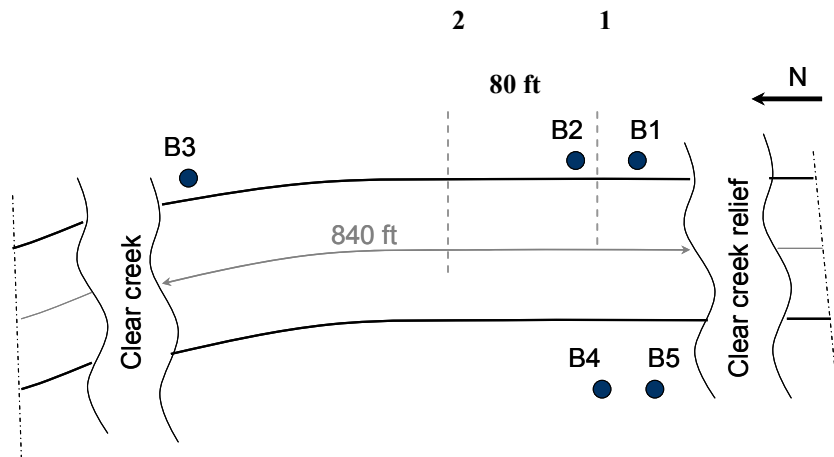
Plan View of SH3 at Clear Creek with the New Boring Locations.
